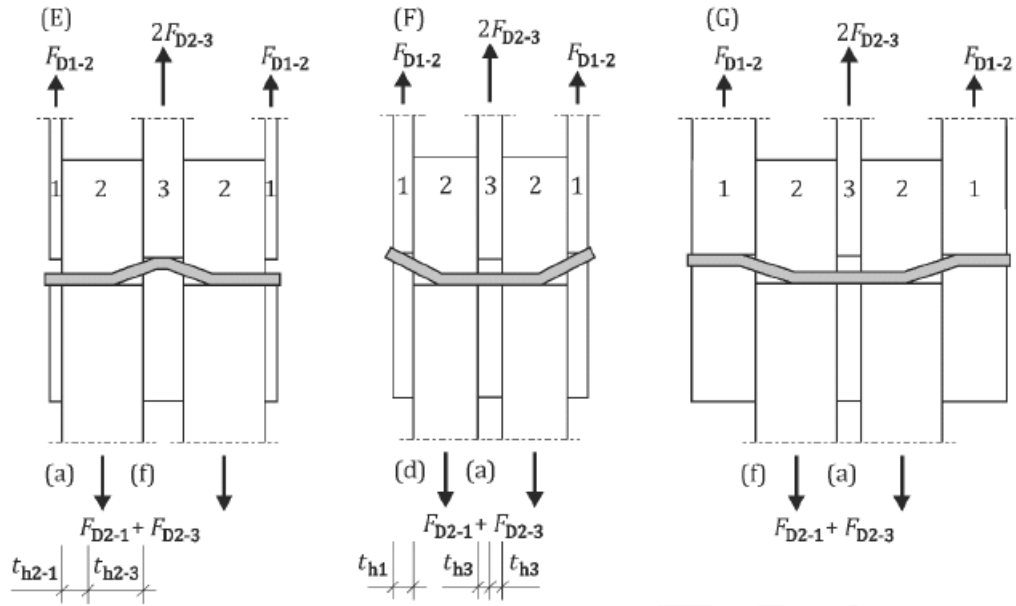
Combinations of failure modes for fasteners in a connection with four shear planes [1].
